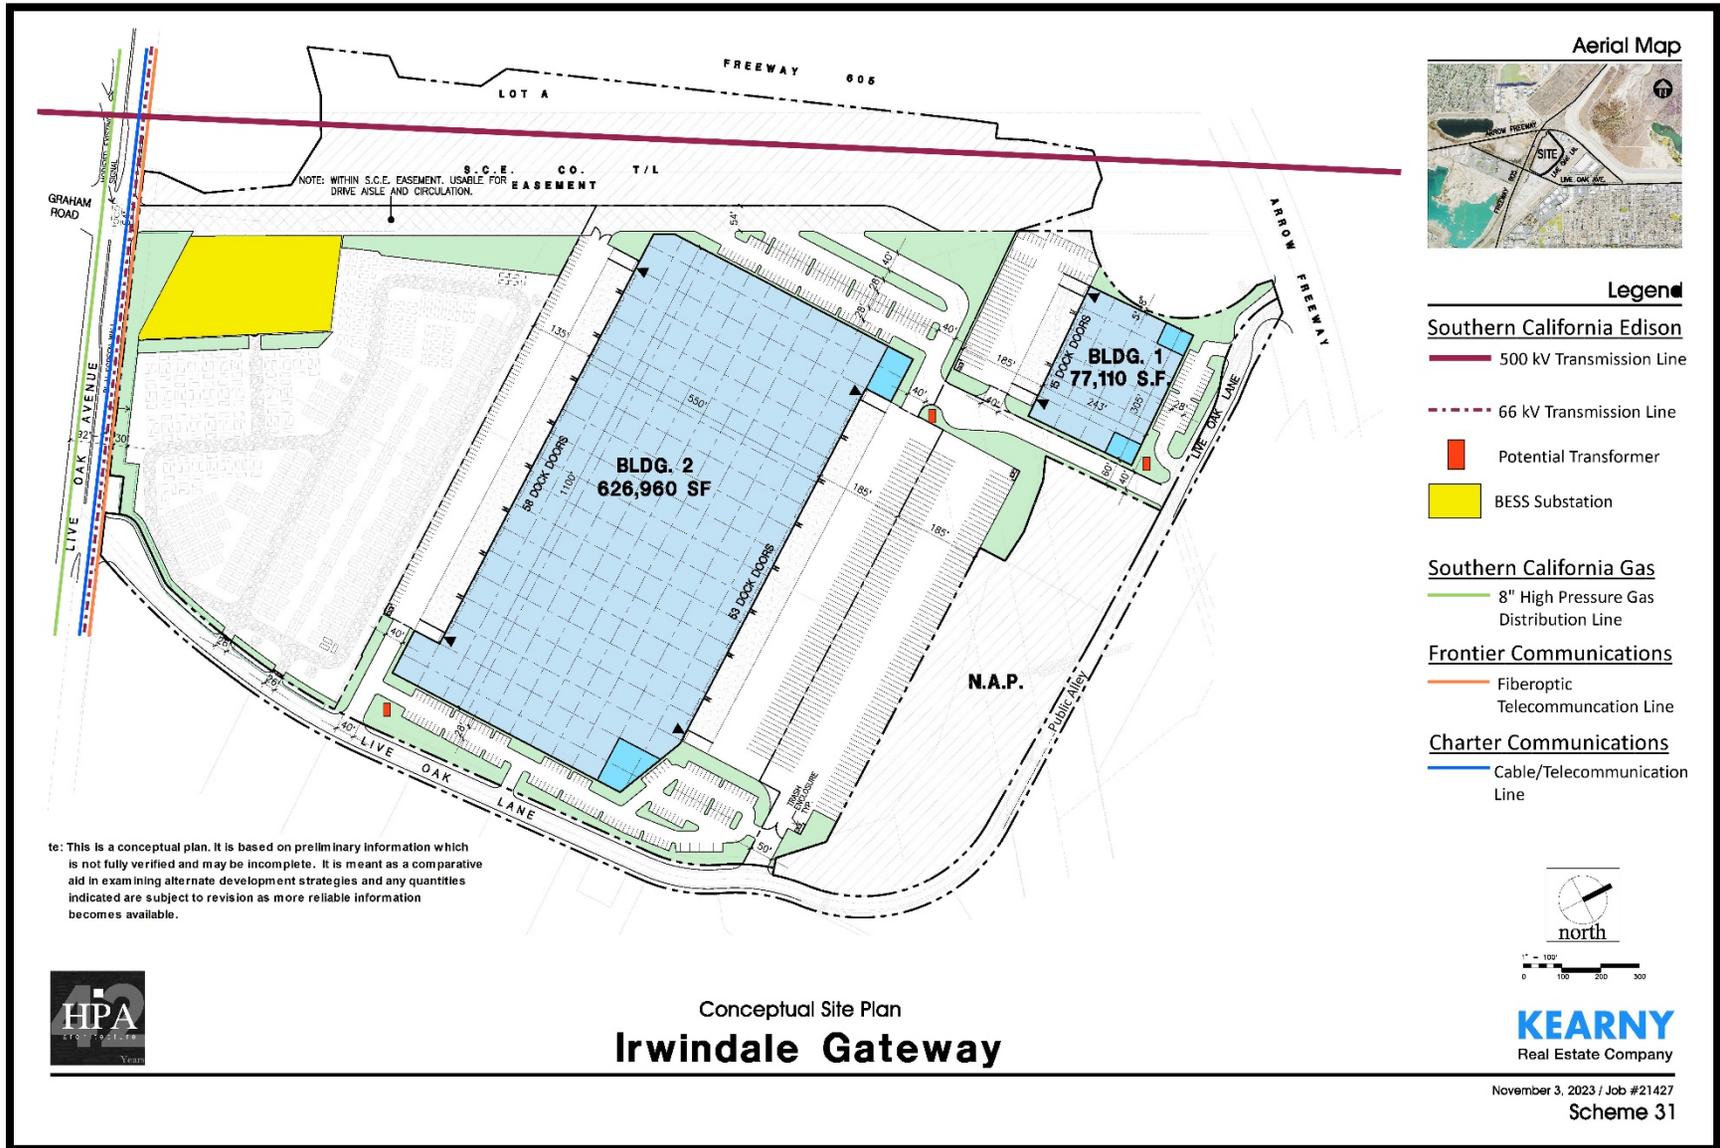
CONCEPTUAL DRY UTILITIES PLAN WITH BESS
